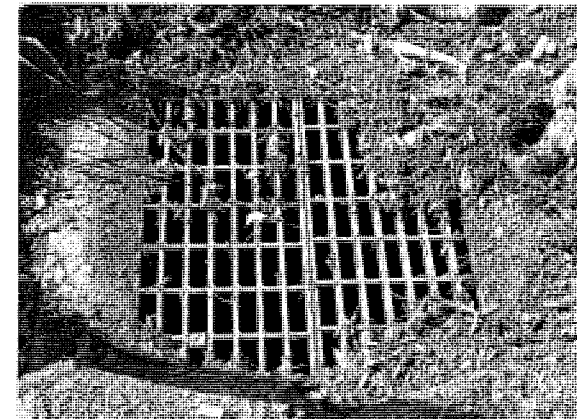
Mulch Material Collecting on the Grating of the Storm Sewer Inlet at the CCC Site.
